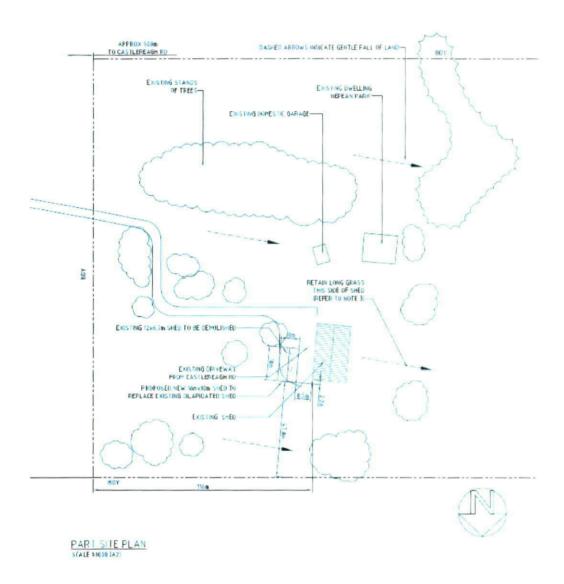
Plan showing the location of the proposed new shed in relation to the existing shed and the homestead building.
